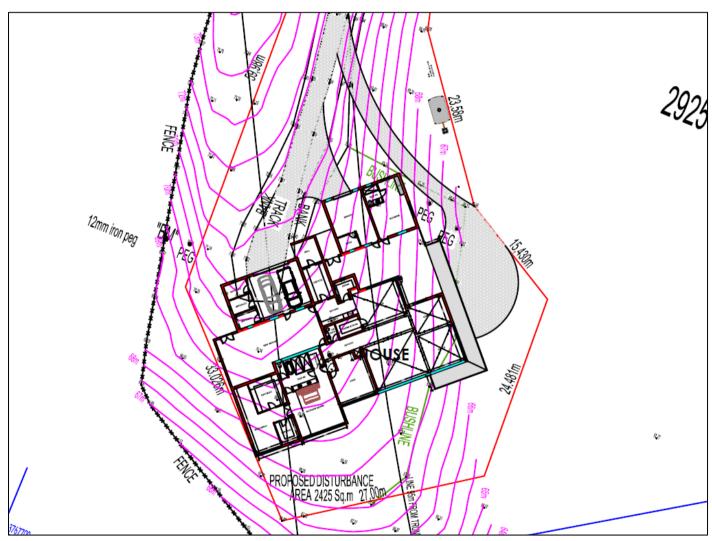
Site Development Plan (Eden Geomatics, 2025)
